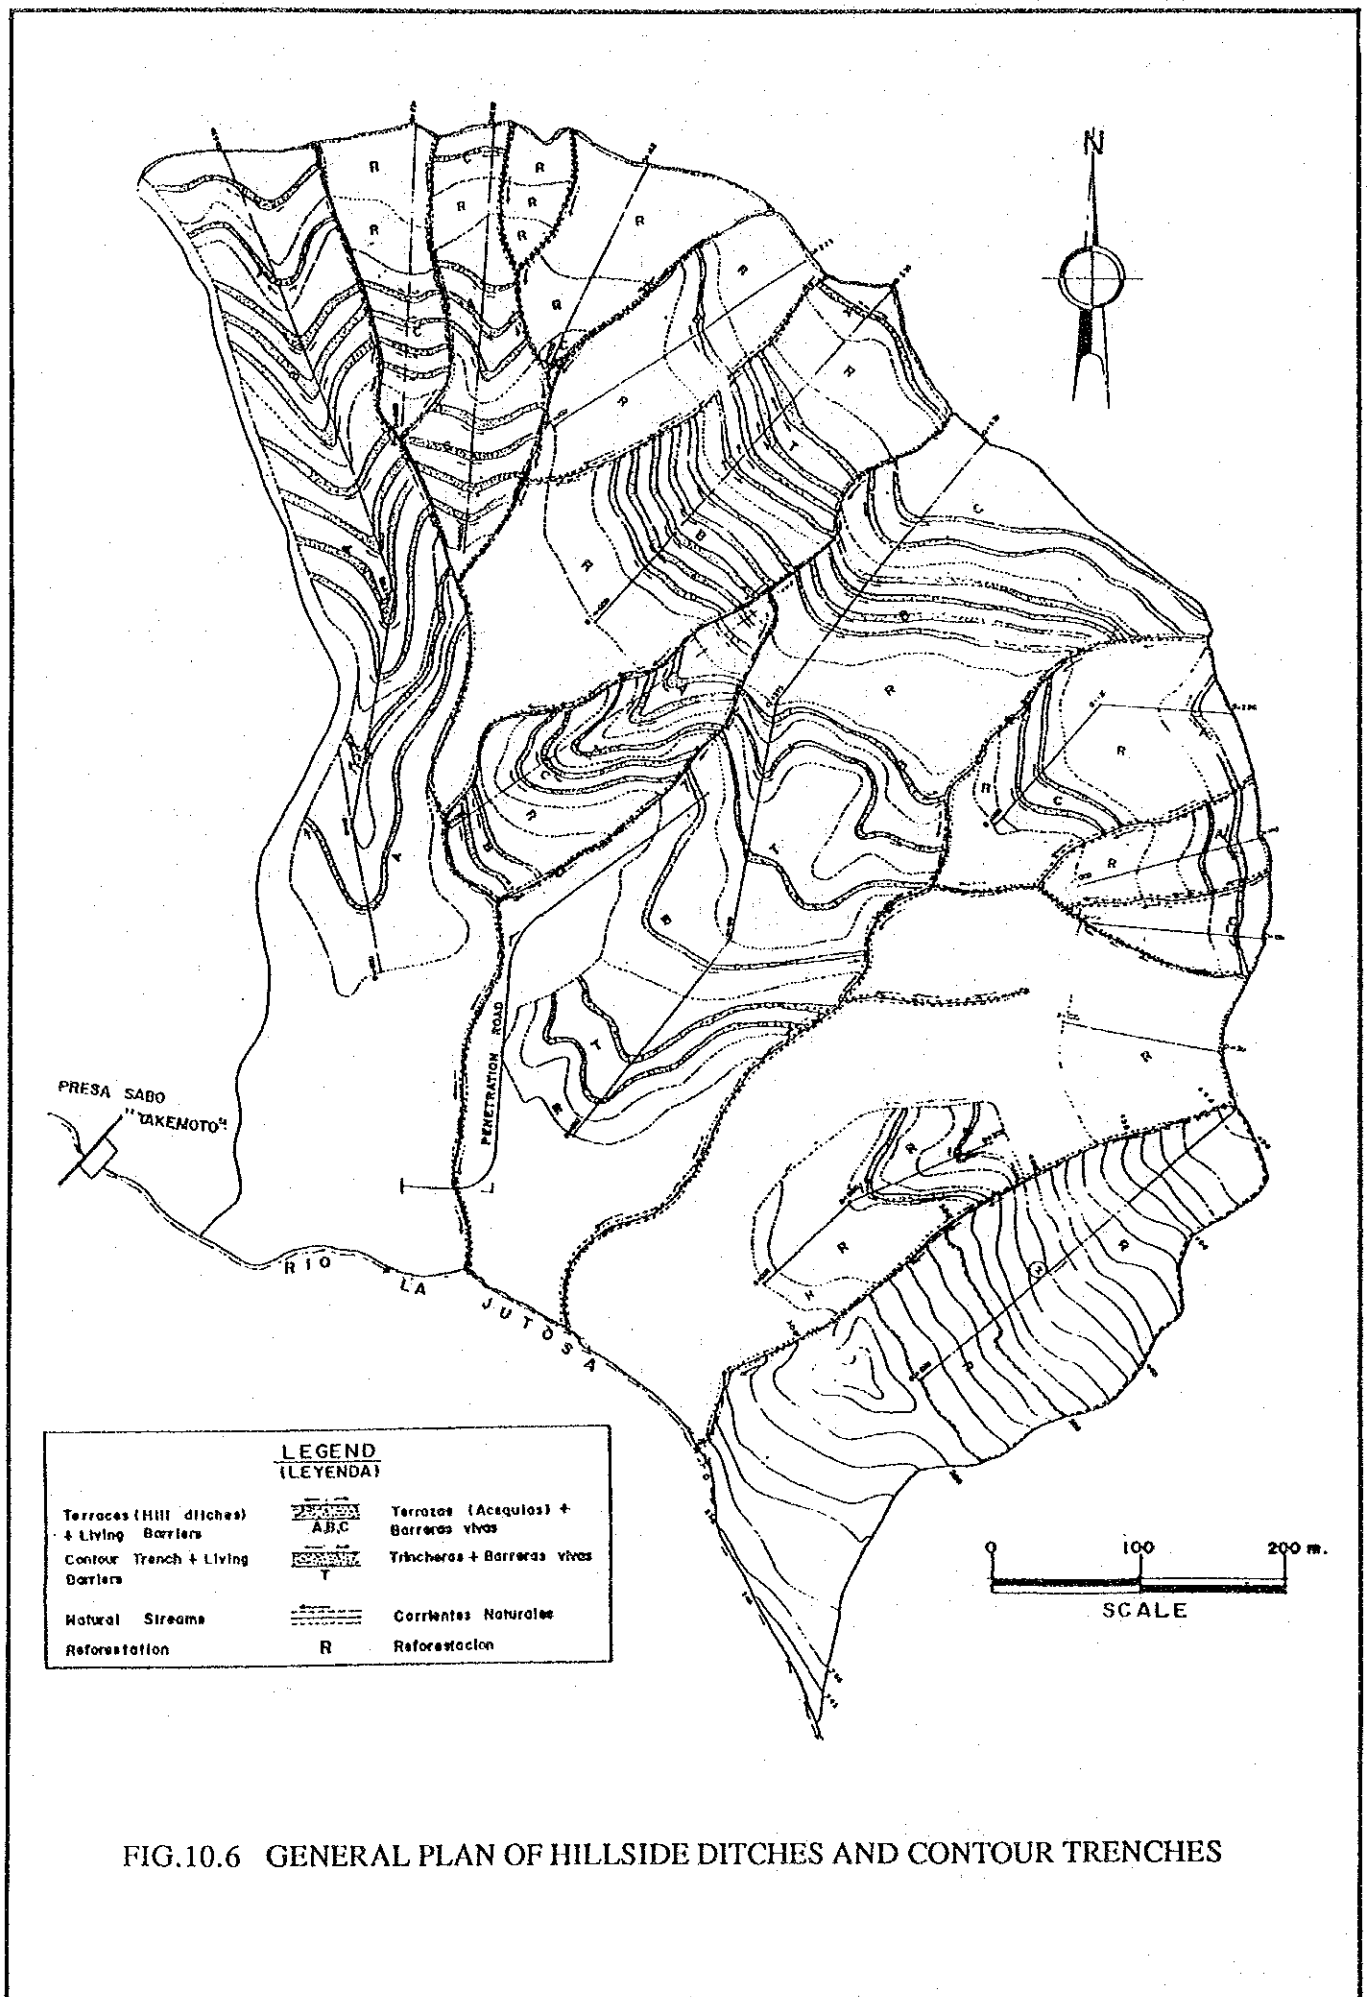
GENERAL PLAN OF HILLSIDE DITCHES AND CONTOUR TRENCHES
